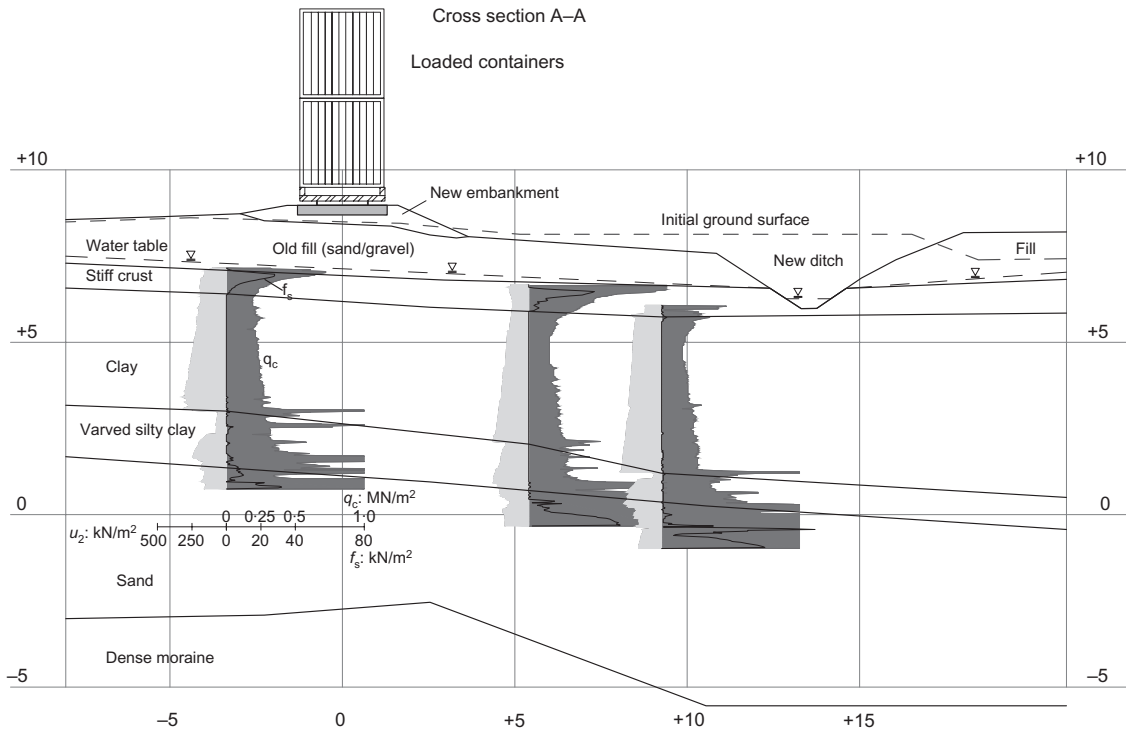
Profile view of embankment test site showing soil stratigraphy inferred from the site investigation
